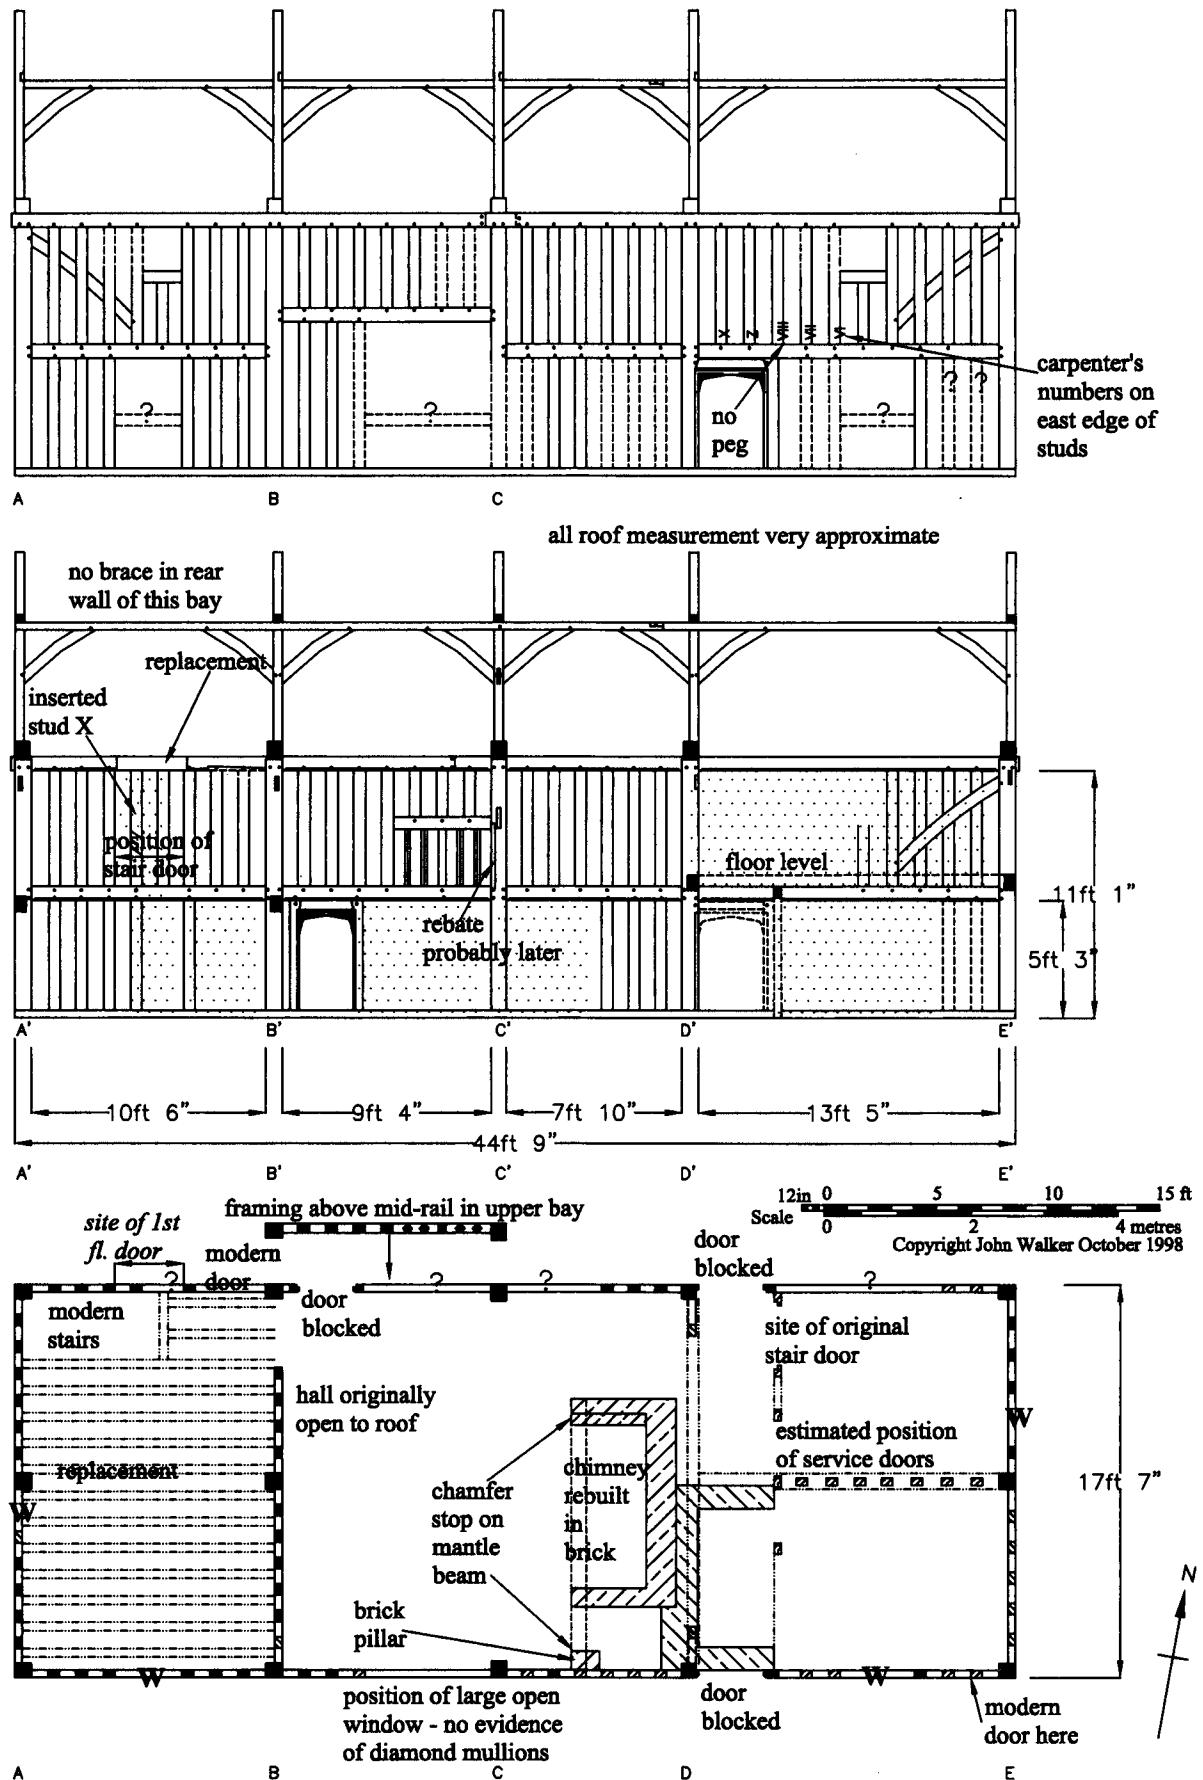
Old Cottage, Little Chesterford, plan and elevations. Stipple on the elevations indicates areas of concealed walling. Hatched studs on the plan are missing.
